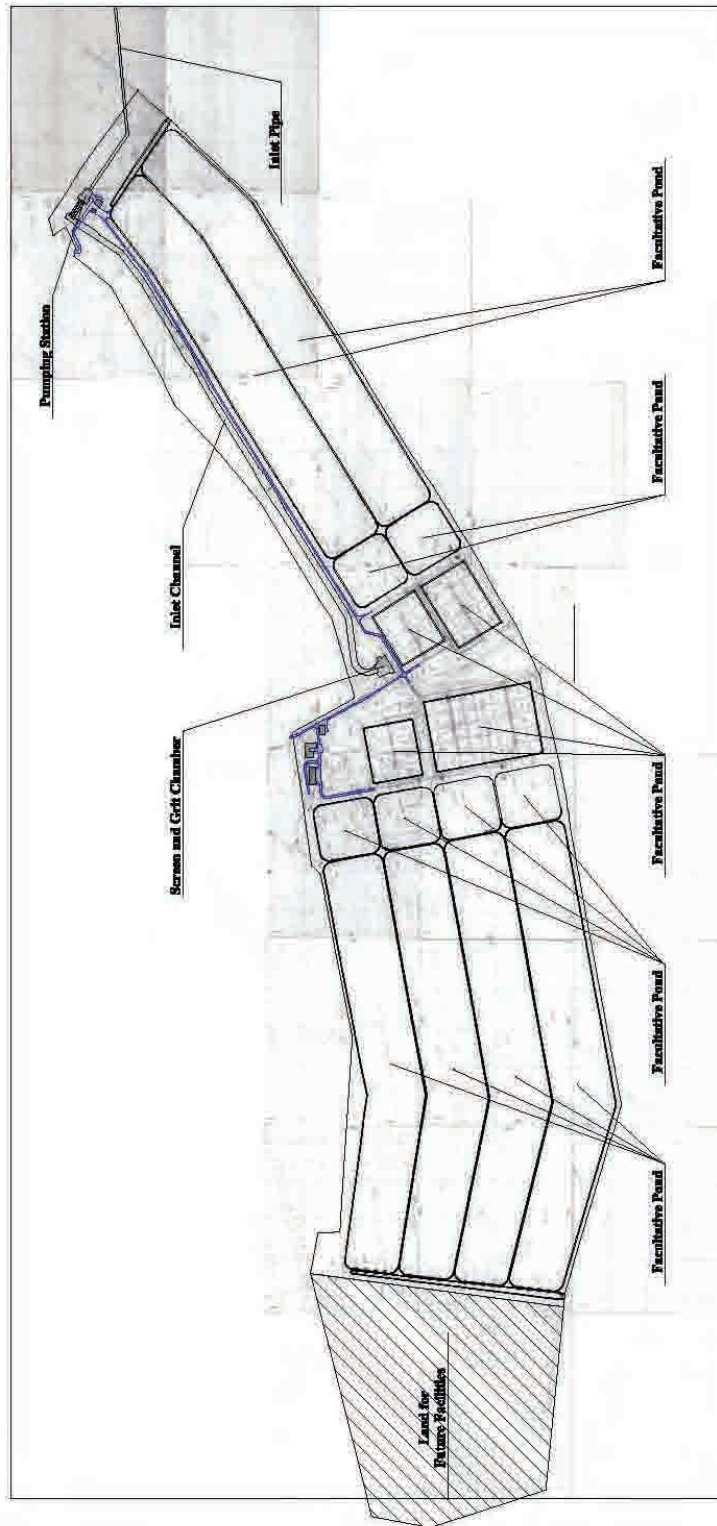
General Plan of Sewage Treatment Plant TP-3
